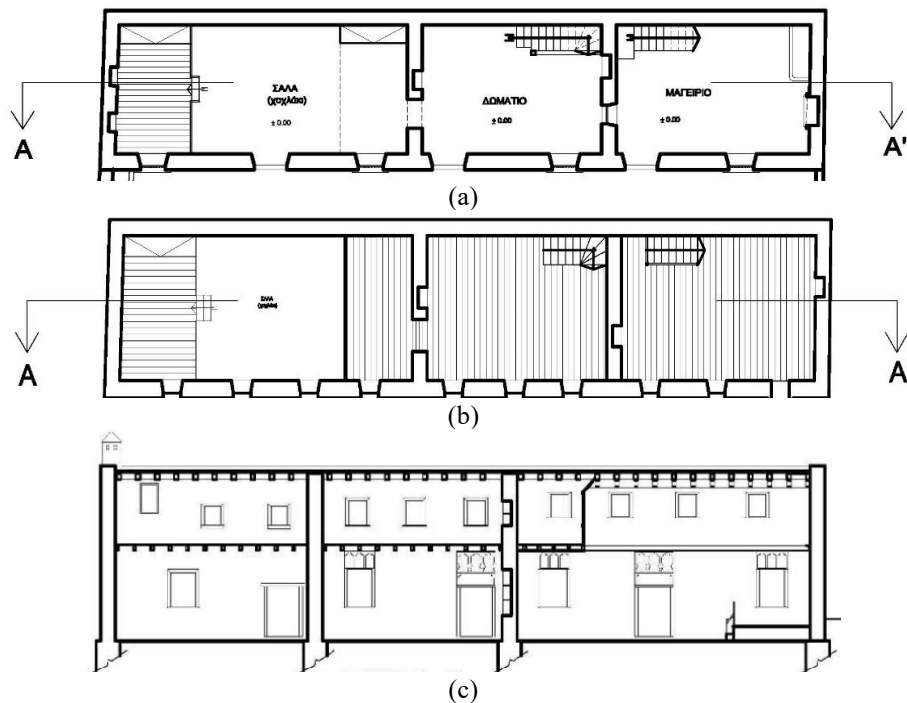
(a) Ground floor plan, (b) first floor plan and (c) longitudinal section A-A' [14]
